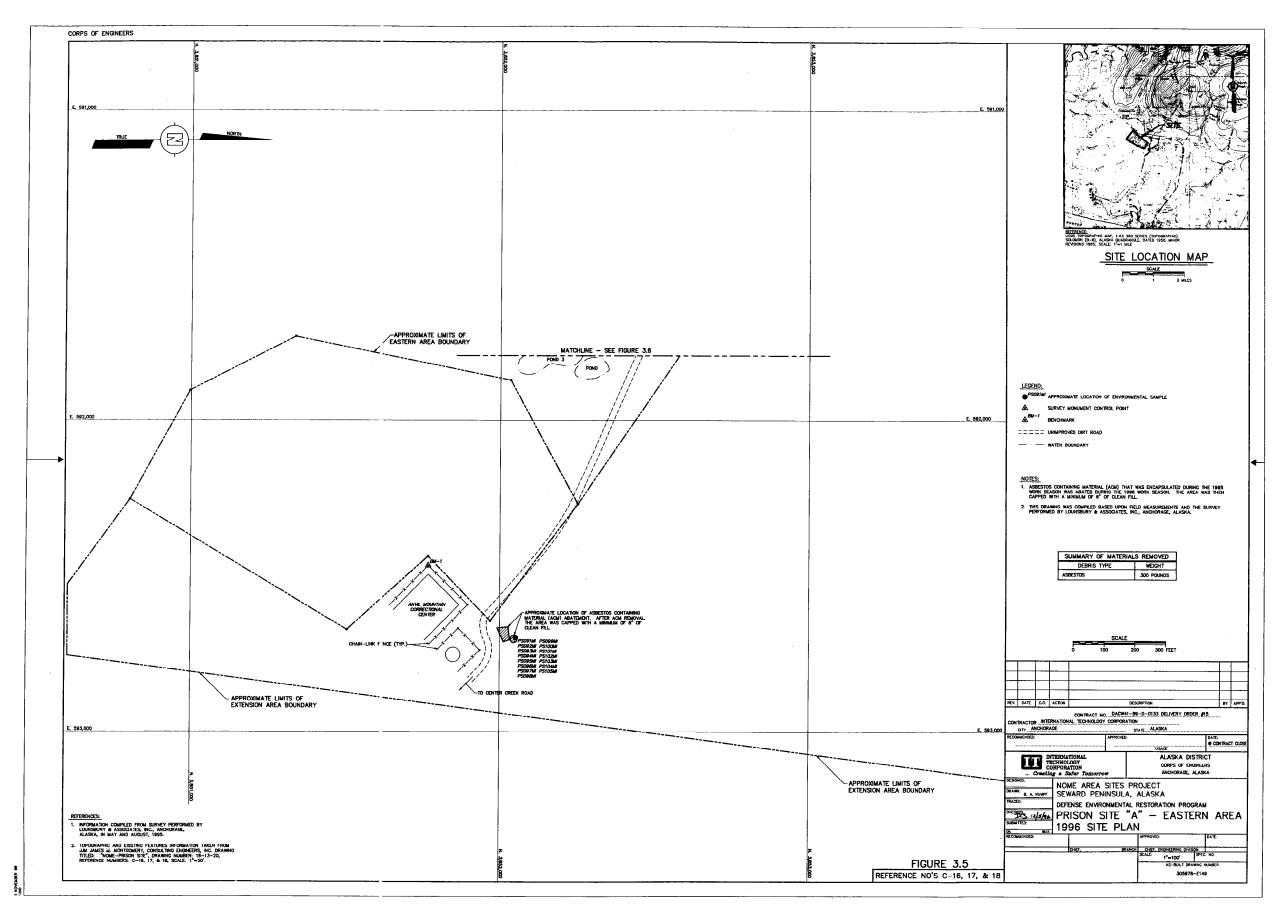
Prison Site 'A' Eastern Area 1996 Site Plan
